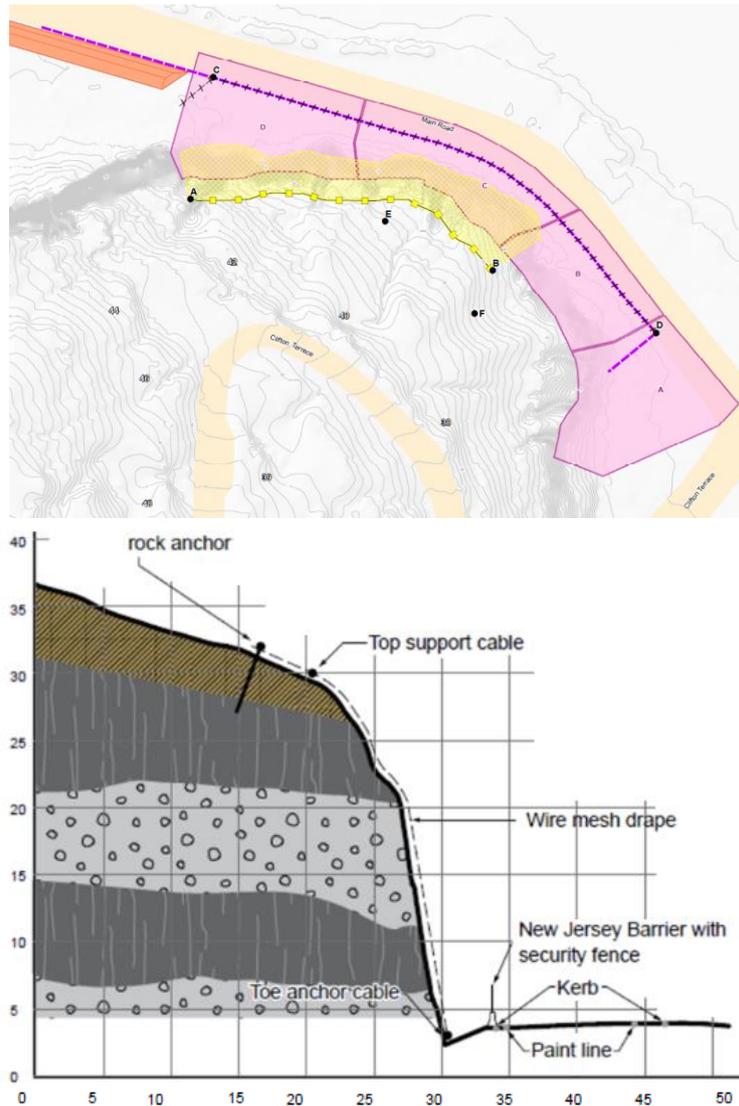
Clifton Hill rockfall mitigation: (top) Site plan with approximate extend of double twist wire mesh; (bottom) Typical cross section with proposed rockfall protection
